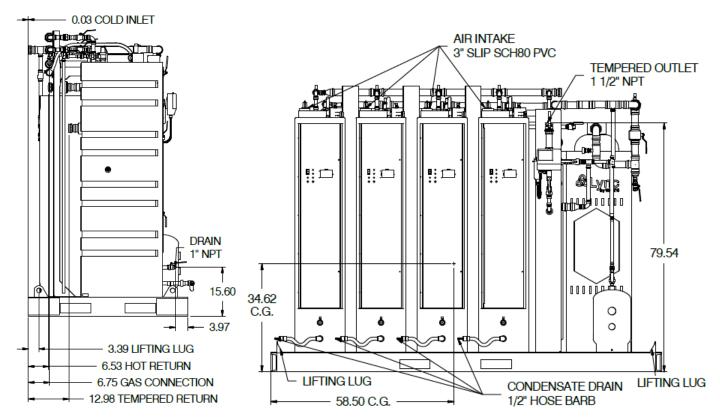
LC-N-800-4 Dimensional Drawing – Left Side & Front View
